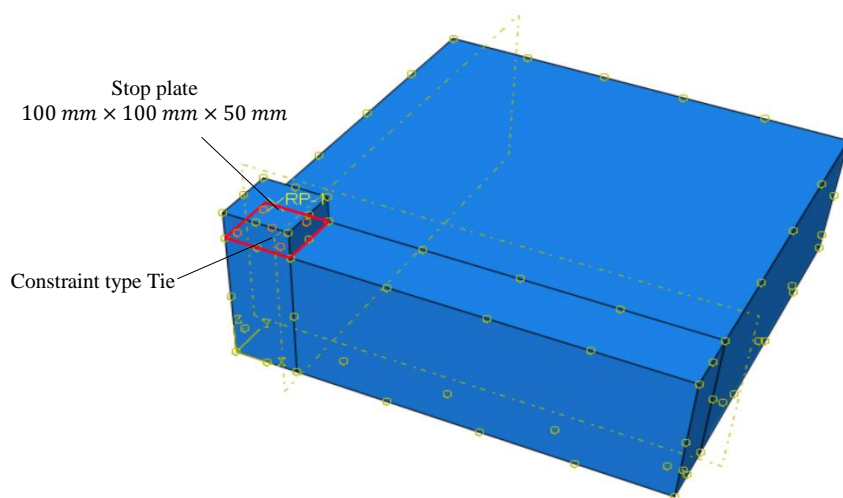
Constraint type Tie between load bearing plate and the surface of the concrete
